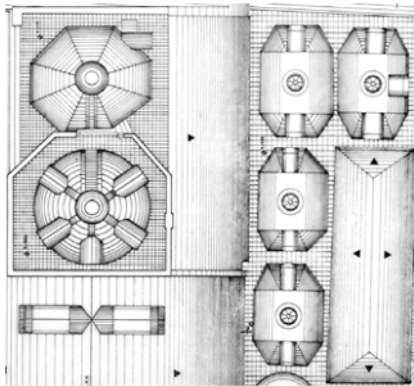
Quito, chapel of Rosario, detail of roof plan, nave, presbytery and sacristy domes (IMP 1999).
